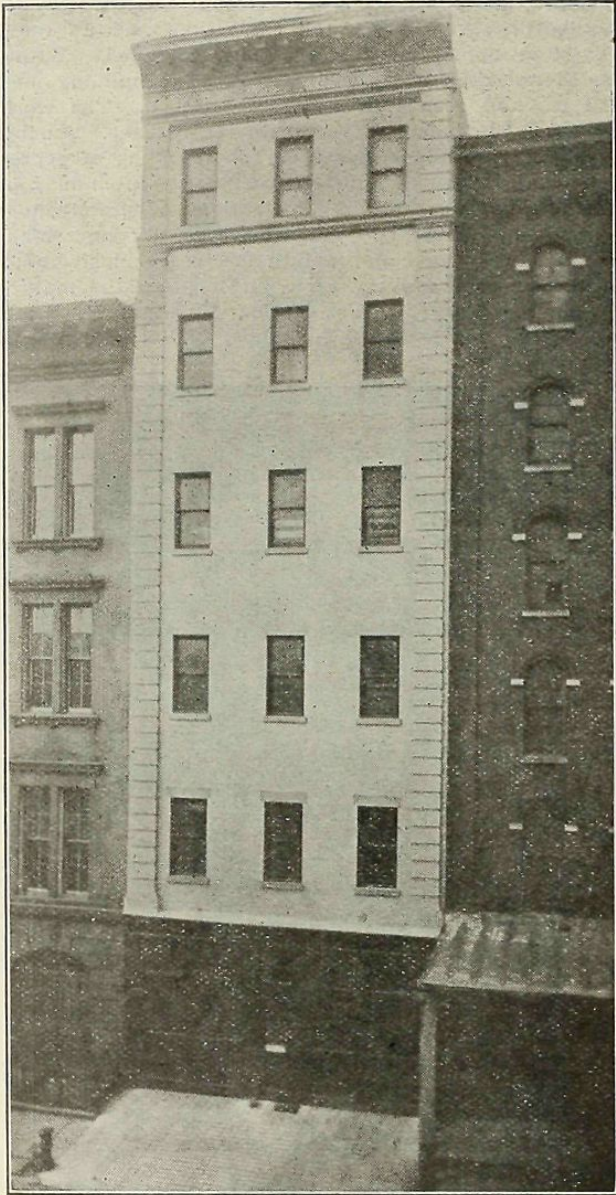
NO. 35 VESTRY STREET. THIS STABLE BUILDING HAS STONE CONCRETE FLOORS WITH STEEL AND IRON COLUMNS.
